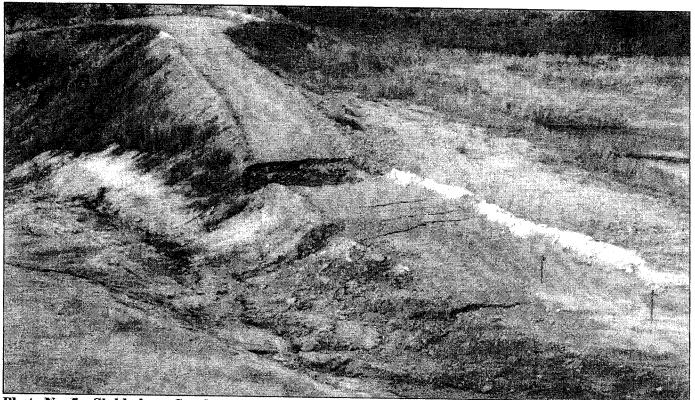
Sinkhole on Southeast Dam, taken on April 7. Photo courtesy of J. Knudsen, Tierra Group
